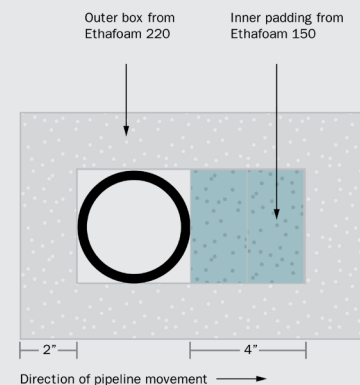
T.E.B. cross section detail for 1" (25mm) of thermal expansion
